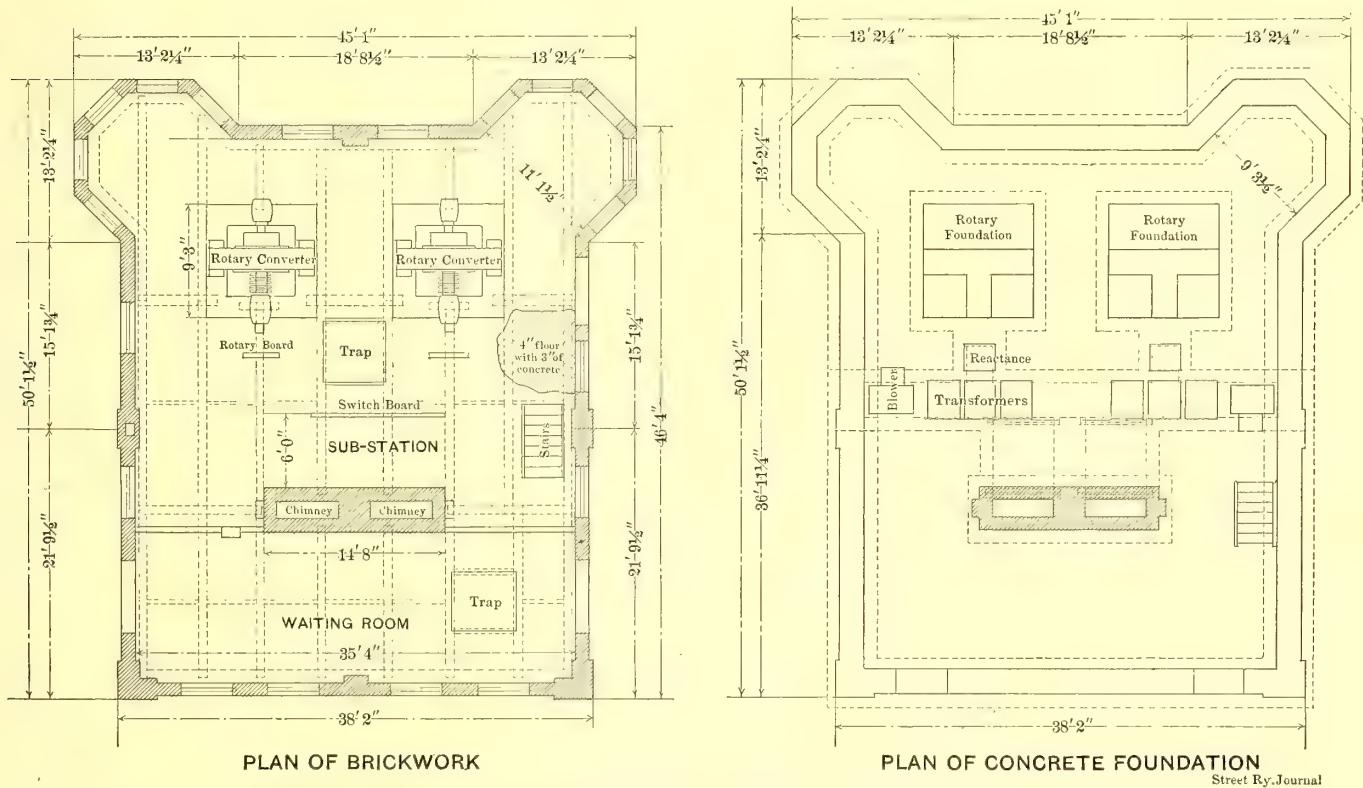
BRICKWORK AND FOUNDATION PLANS OF CLEAR CREEK JUNCTION SUB-STATION
